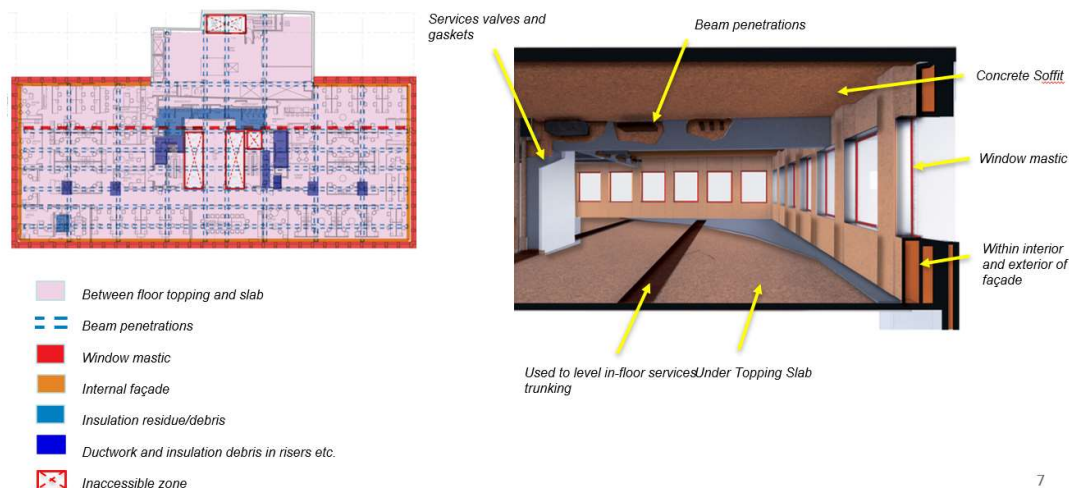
Diagram illustrating location and extent of asbestos through the building structure. (Source: Architectus)
